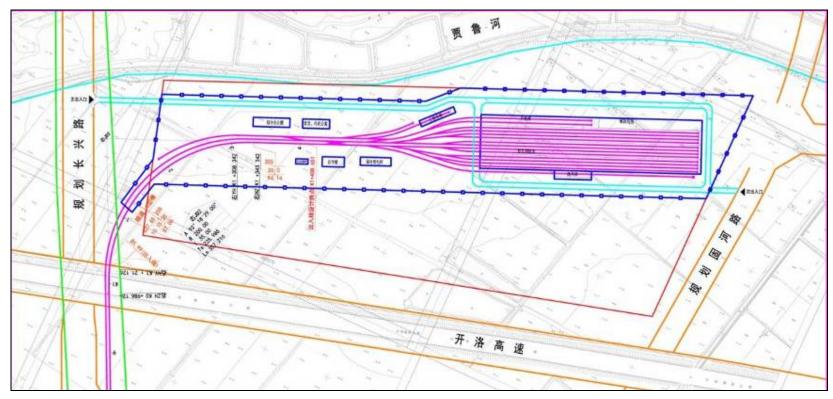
Layout Plan of Xinliu Road Parking Lot
